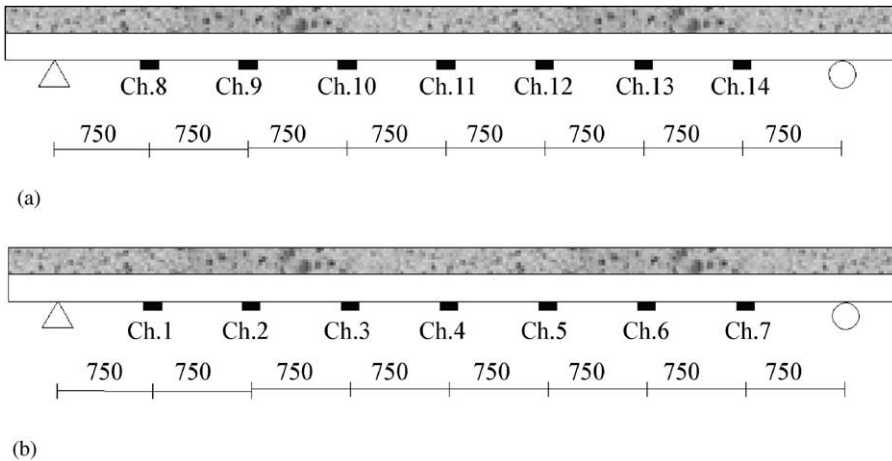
Measurement locations (lengths in mm): (a) left girder; and (b) right girder.
